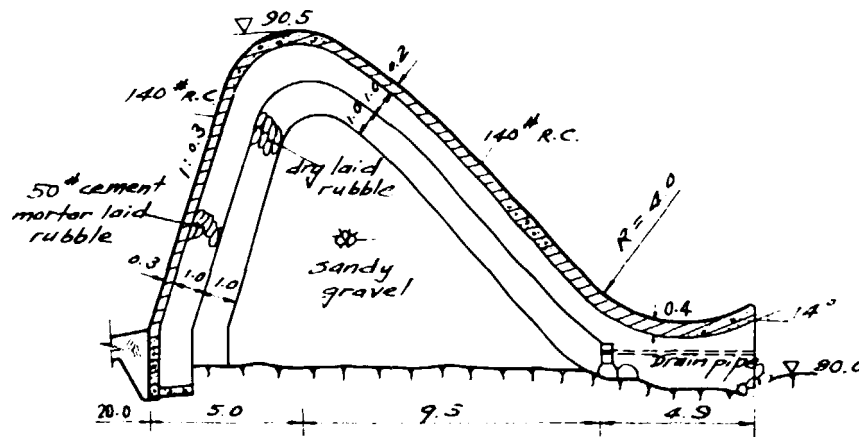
Cross section of masonry hardshell dam (unit m)
